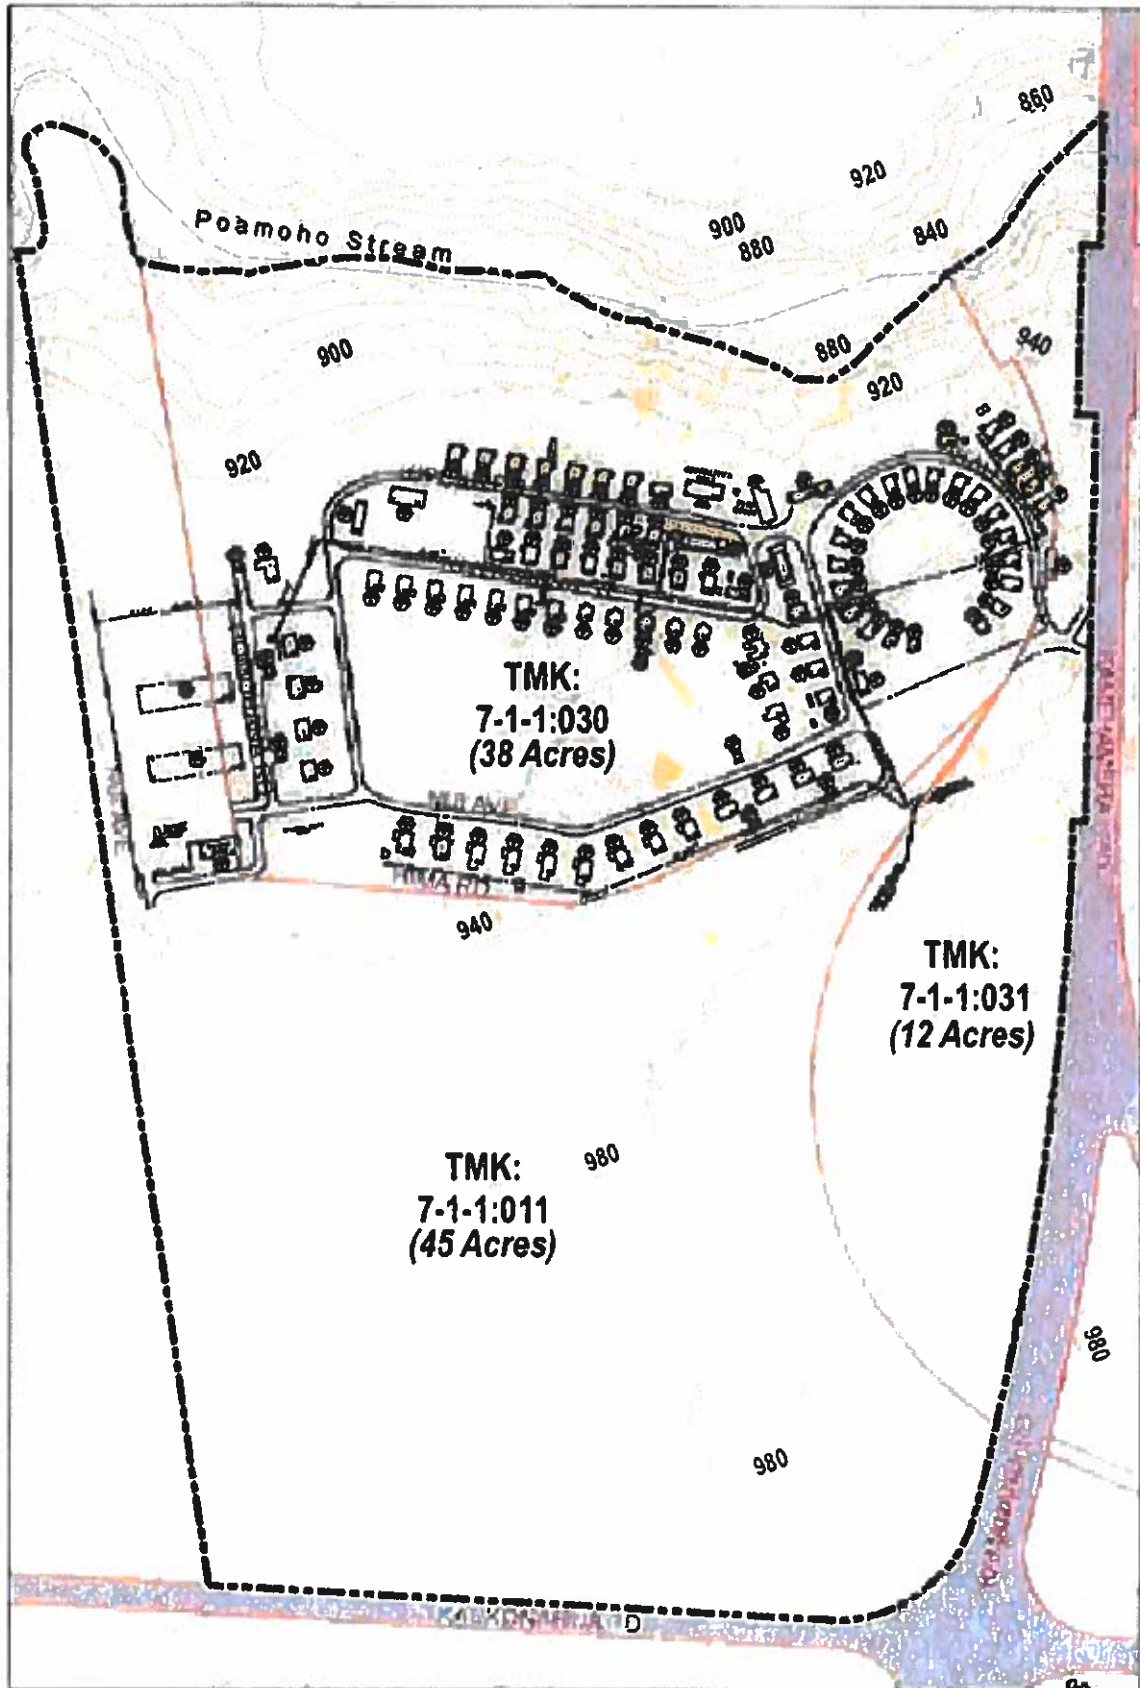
Former Camp Site Plan Overlay on Aerial Photograph (2002)
